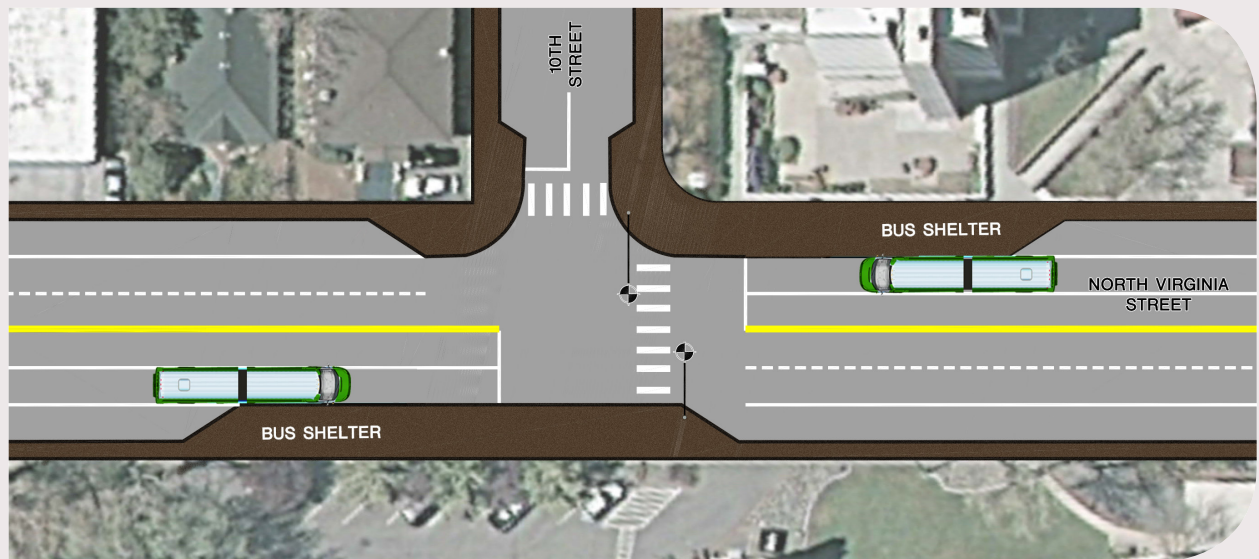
Plan view of Manzanita Hall RAPID station (preliminary concept - subject to change)
